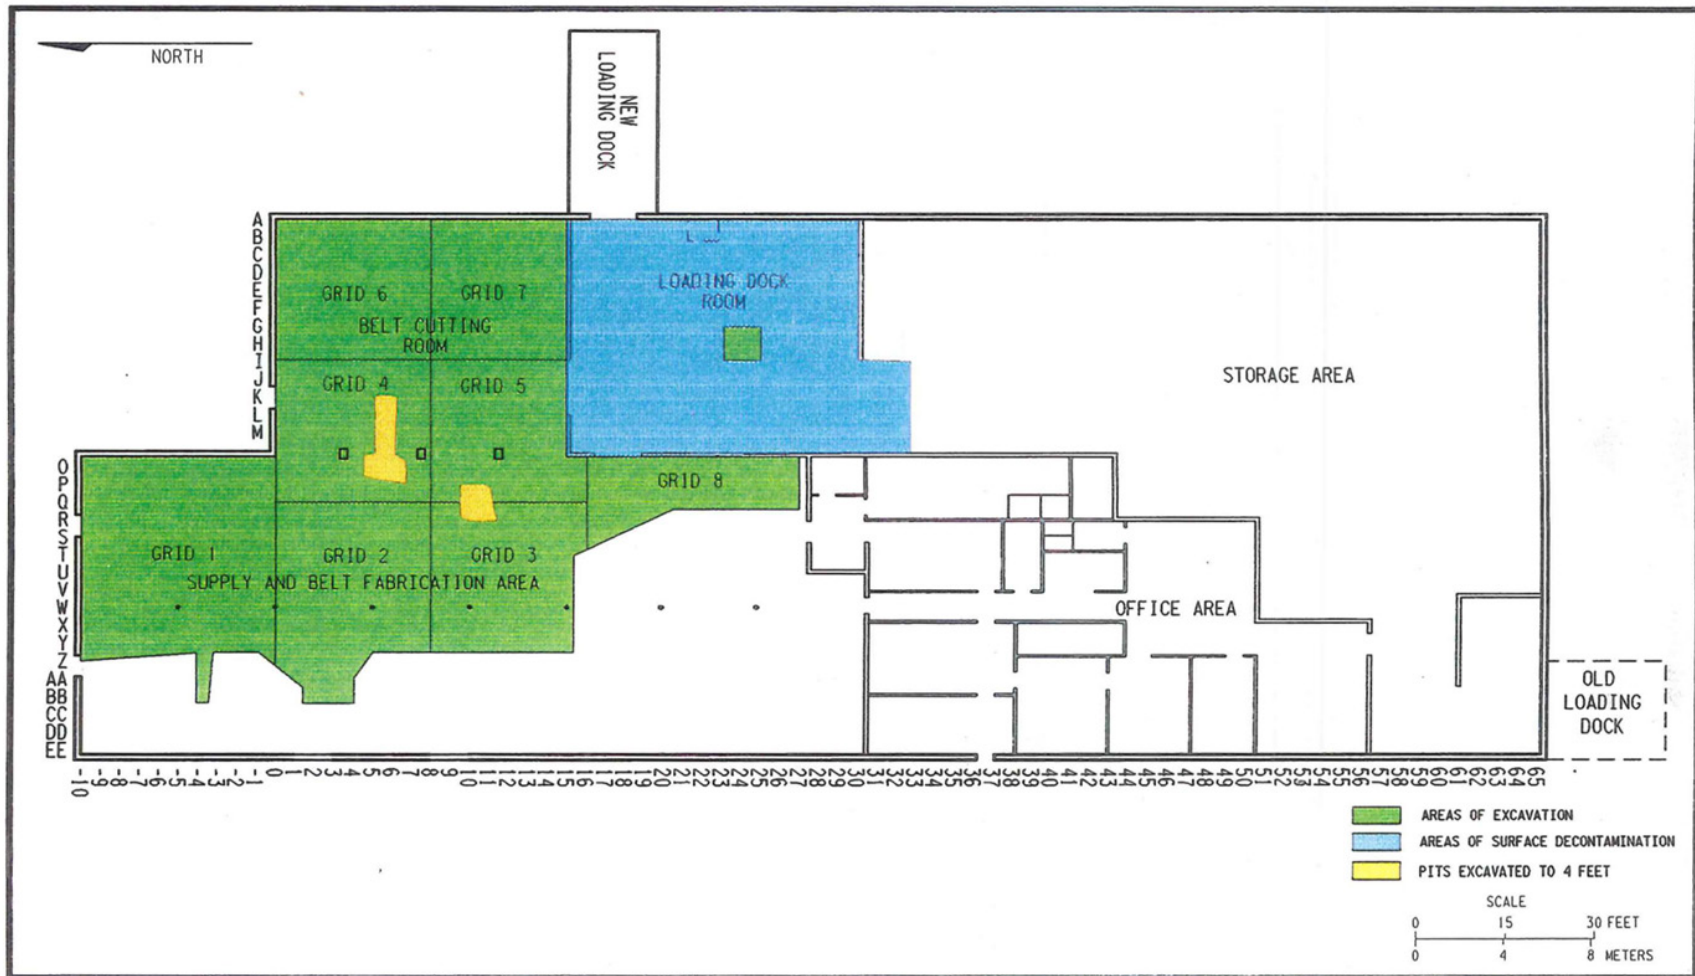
Excavation and Surface Decontamination Areas at the Springdale Site
